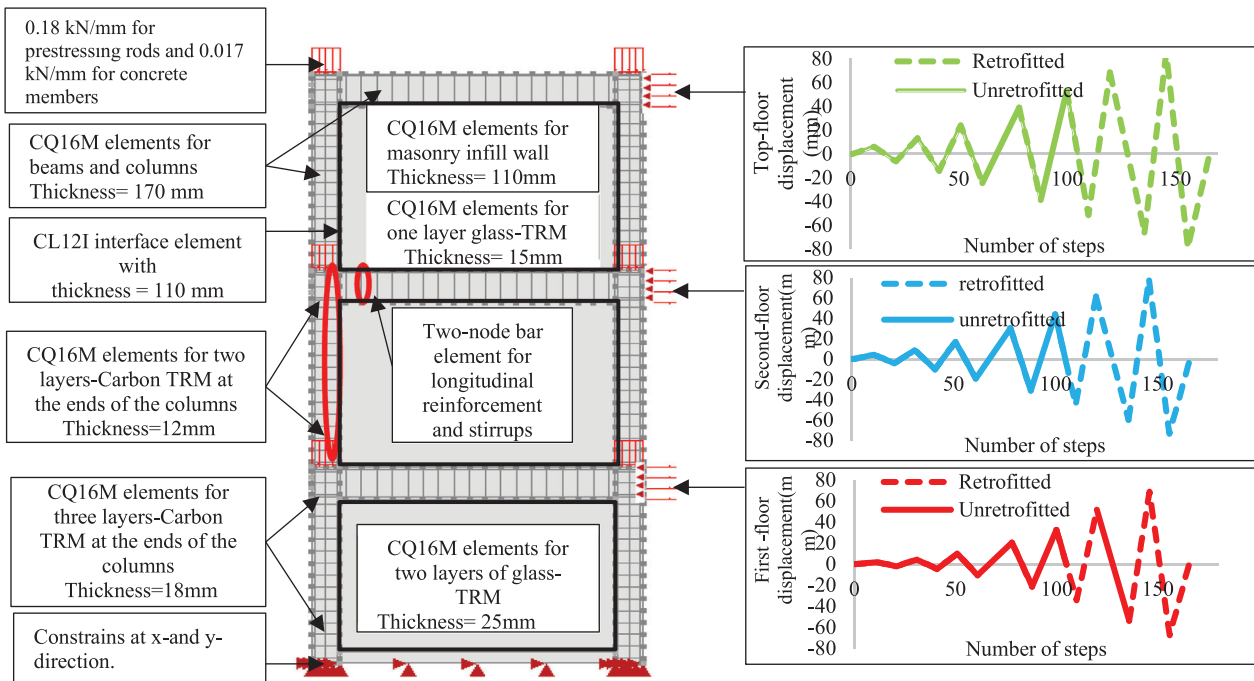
Geometry, type of elements, constraints, and loading scheme of the numerical models
